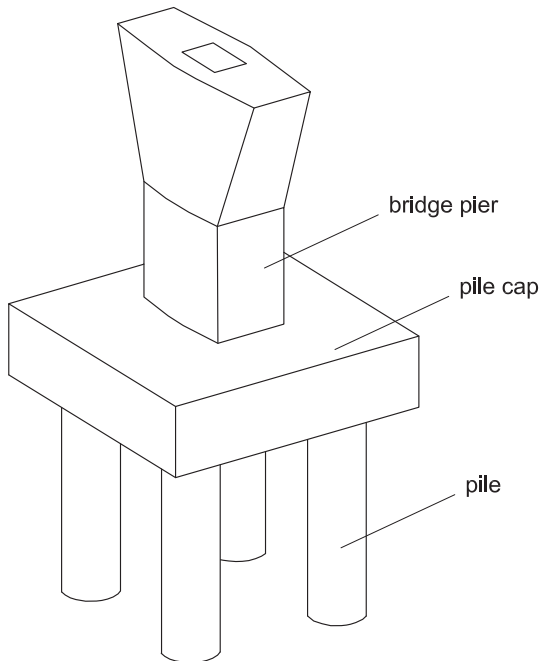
Illustration of bridge substructure with pier, pile cap and piles.
